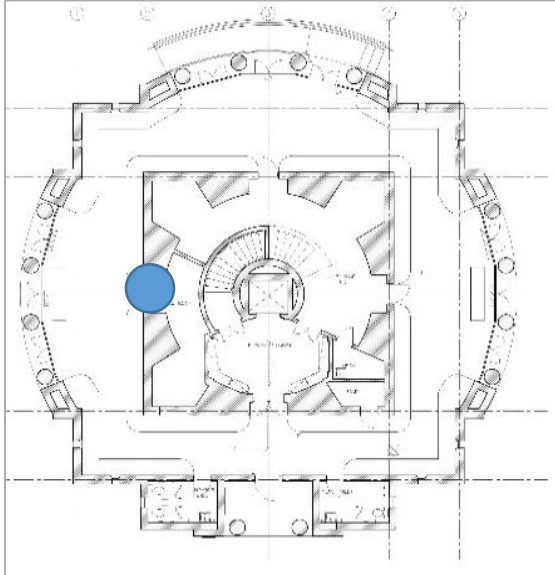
Location of the water damage on the *California* Mural at the first floor.
